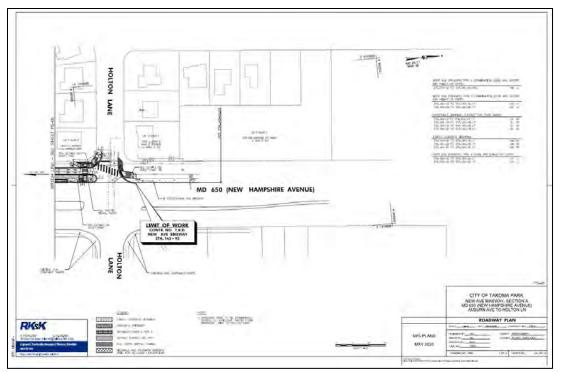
Plan View of Proposed New Avenue Section A Improvements (Part 6)
